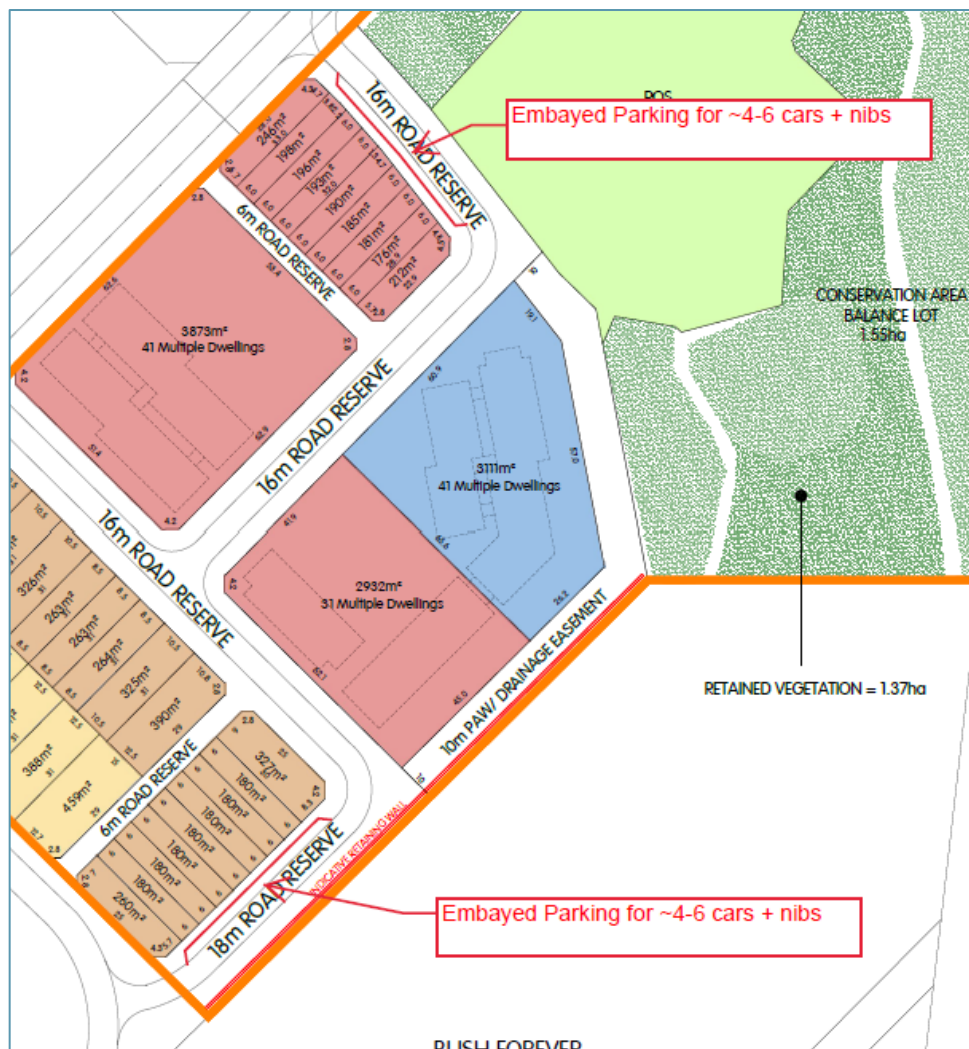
Proposed Embayed Parking Locations for Laneway Lots
